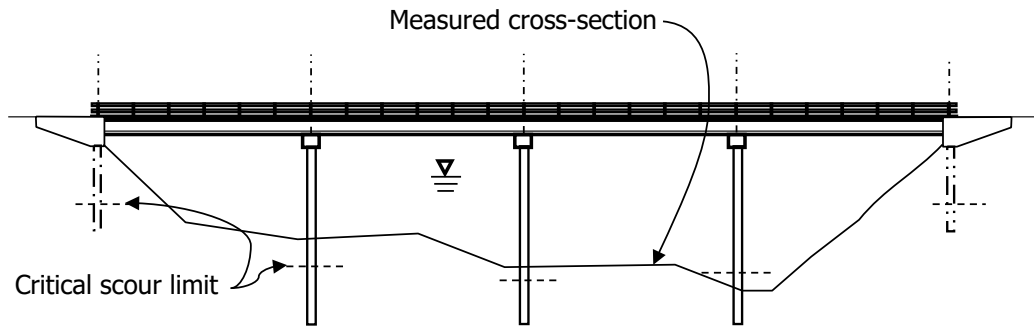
Elevation view showing critical scour limits and stream cross-section for a bridge.
